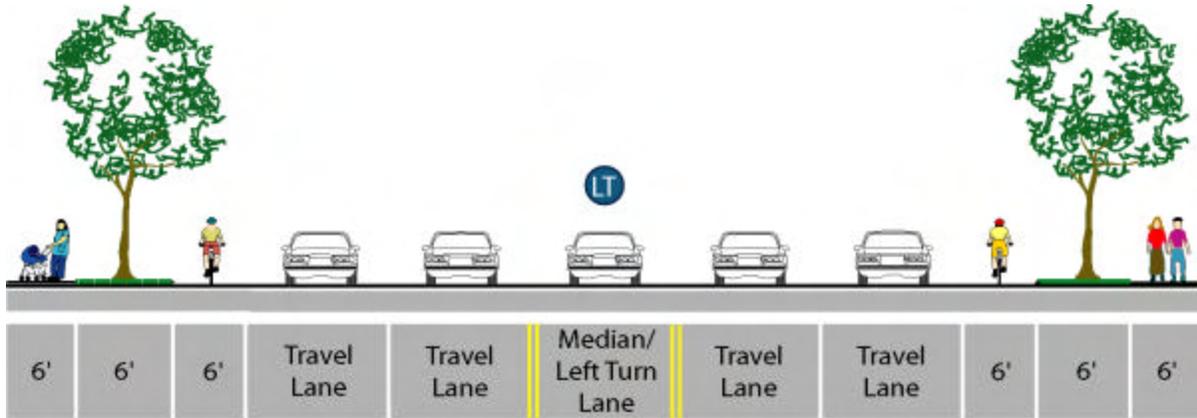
Major Roadway with 6' Minimum Planter Strip
